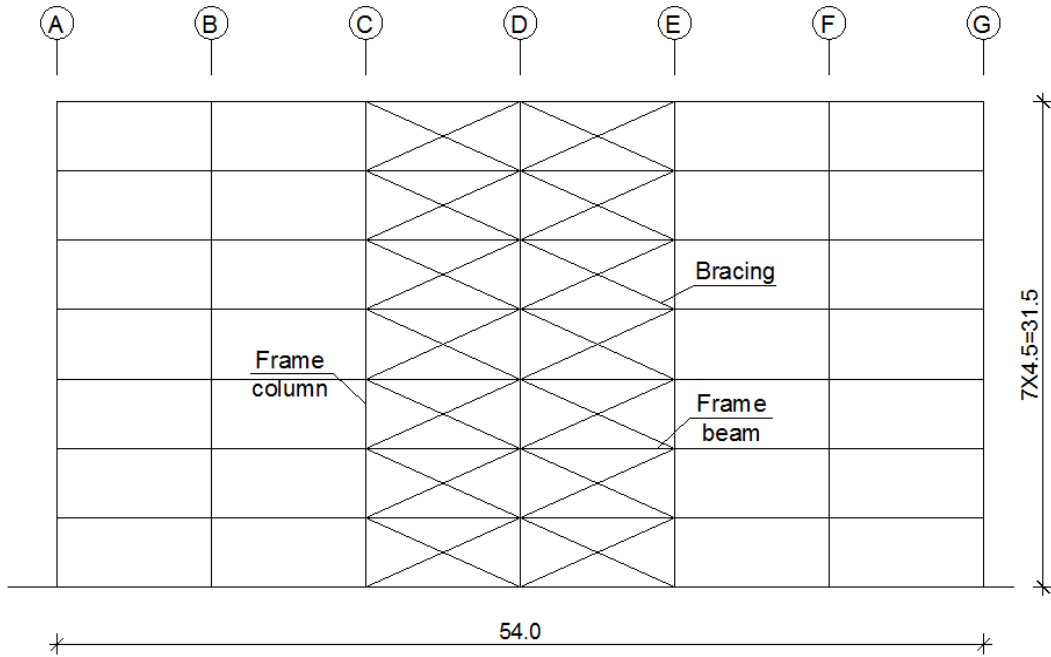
Model building elevation - 7-story CBF, $q = 4$
